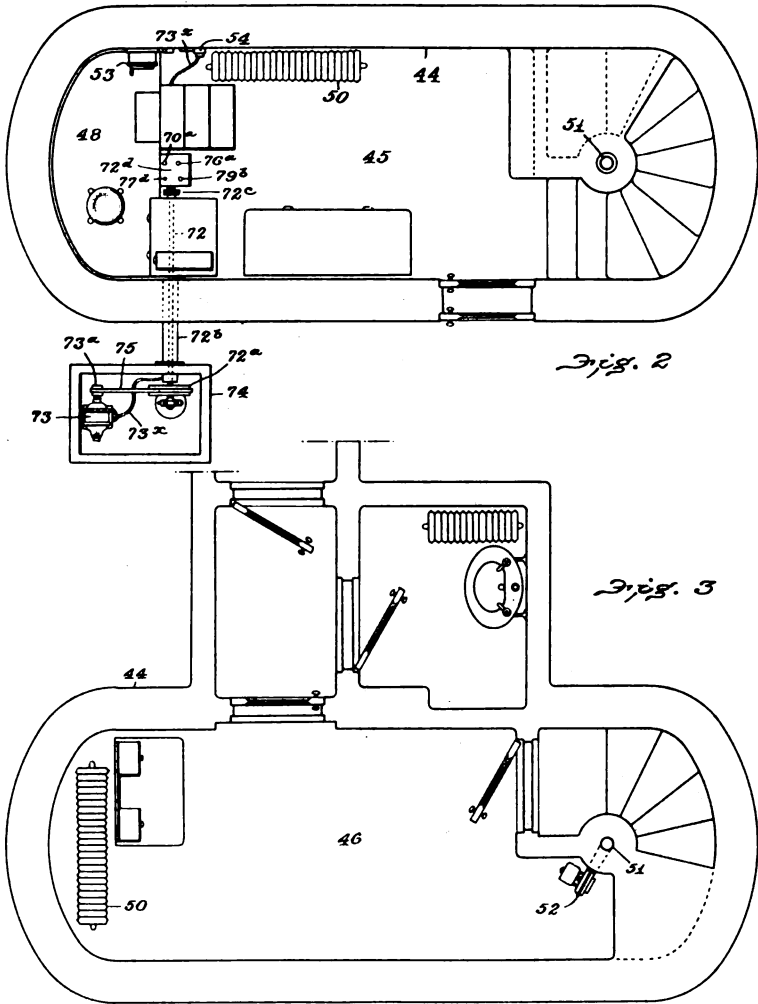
FLOOR PLAN OF THE UPPER COMPARTMENT OF OBSERVING ROOM AND THE BOX OUTSIDE THE BUILDING IN WHICH THE MOTOR IS LOCATED
